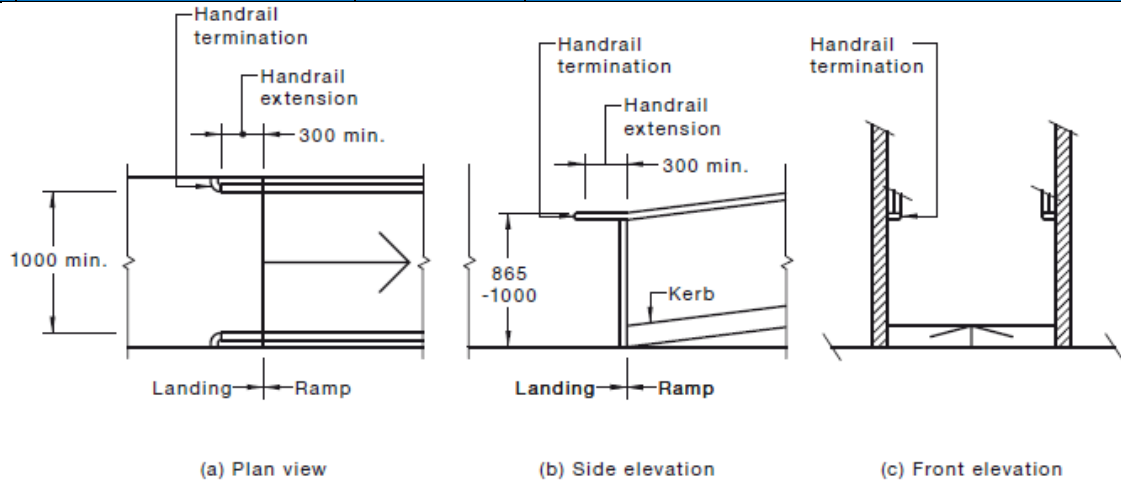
(A) RAMP HANDRAILS—EXAMPLES OF HANDRAIL TERMINATIONS
